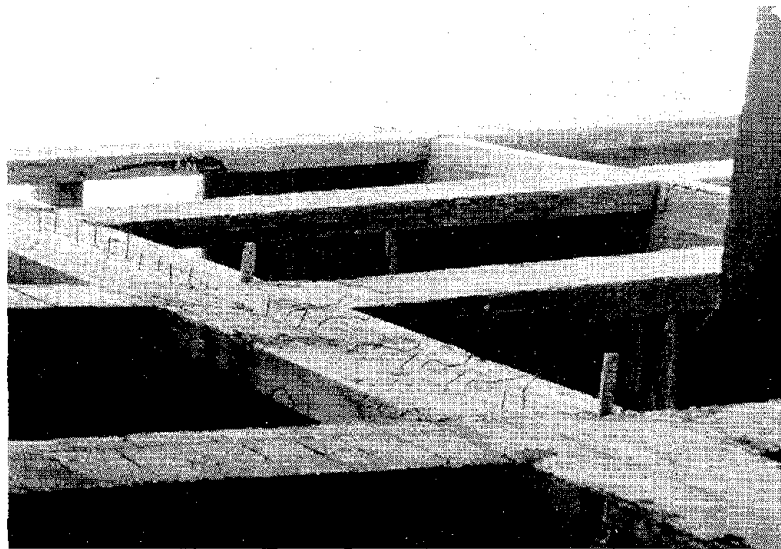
Poor construction quality in reinforced concrete frame. The columns run from lower right to upper left. The beams are roughly horizontal in this photograph.
